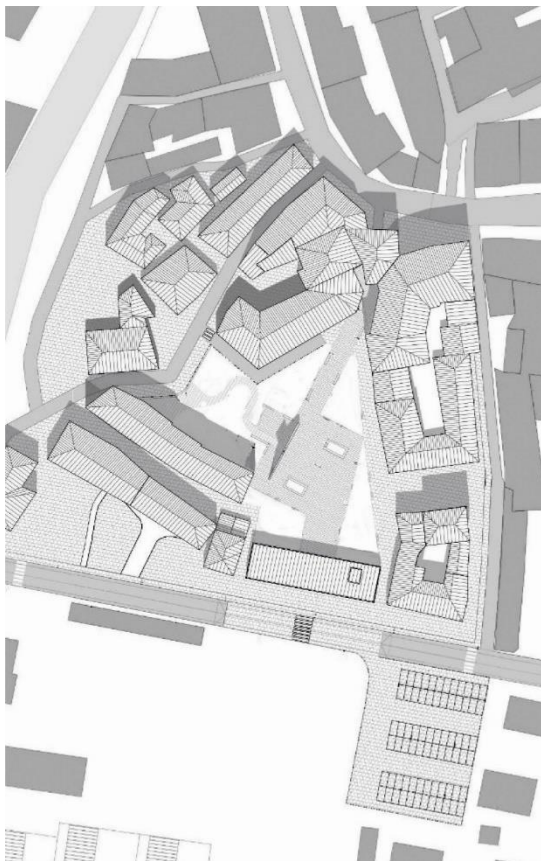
, 12, 13, 14, 15. Lorenzo Grego, Giovanna Maracci, redevelopment project of the area named Piazzale della Lana in the city of Feltre. Project planivolumetric representation, general ground floor plan and views of the new three squares.
